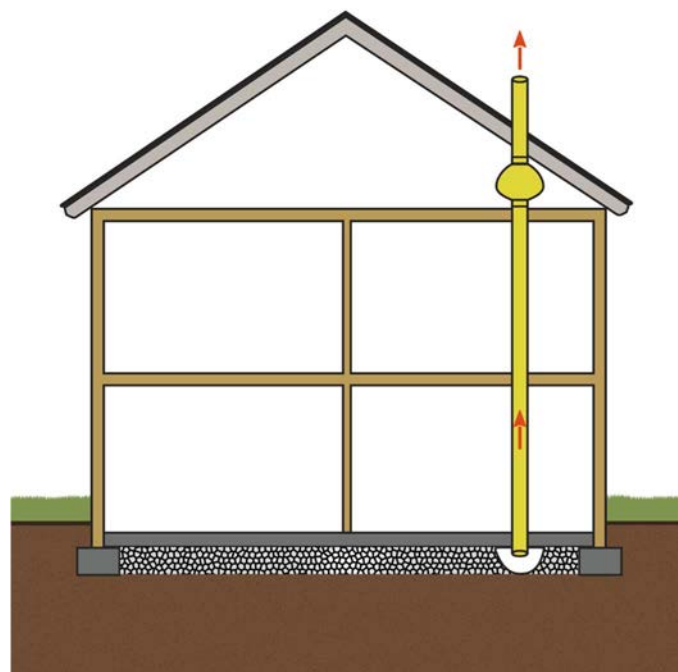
Sub-slab depressurization with internal fan in ceiling and roof level exhaust.
